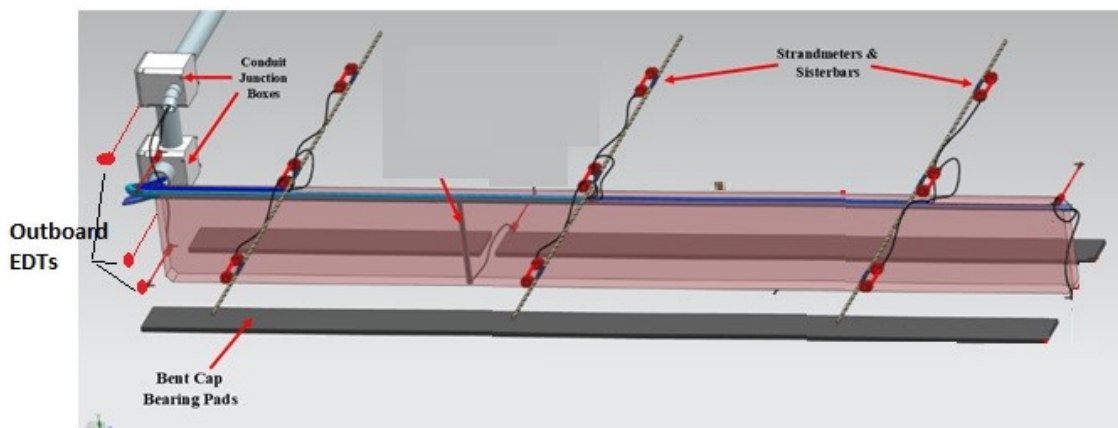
Exposed View of Cable Routing (EPS is Translucent)
